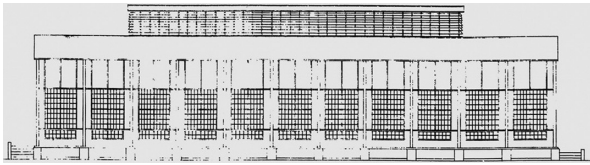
Elevation drawing of Former Forging Shop⁵⁾
